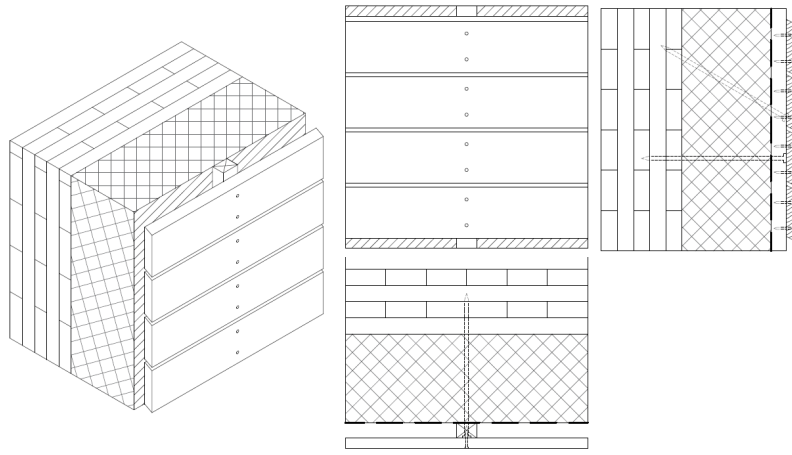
Horizontal external timber cladding and battens on rigid insulation
